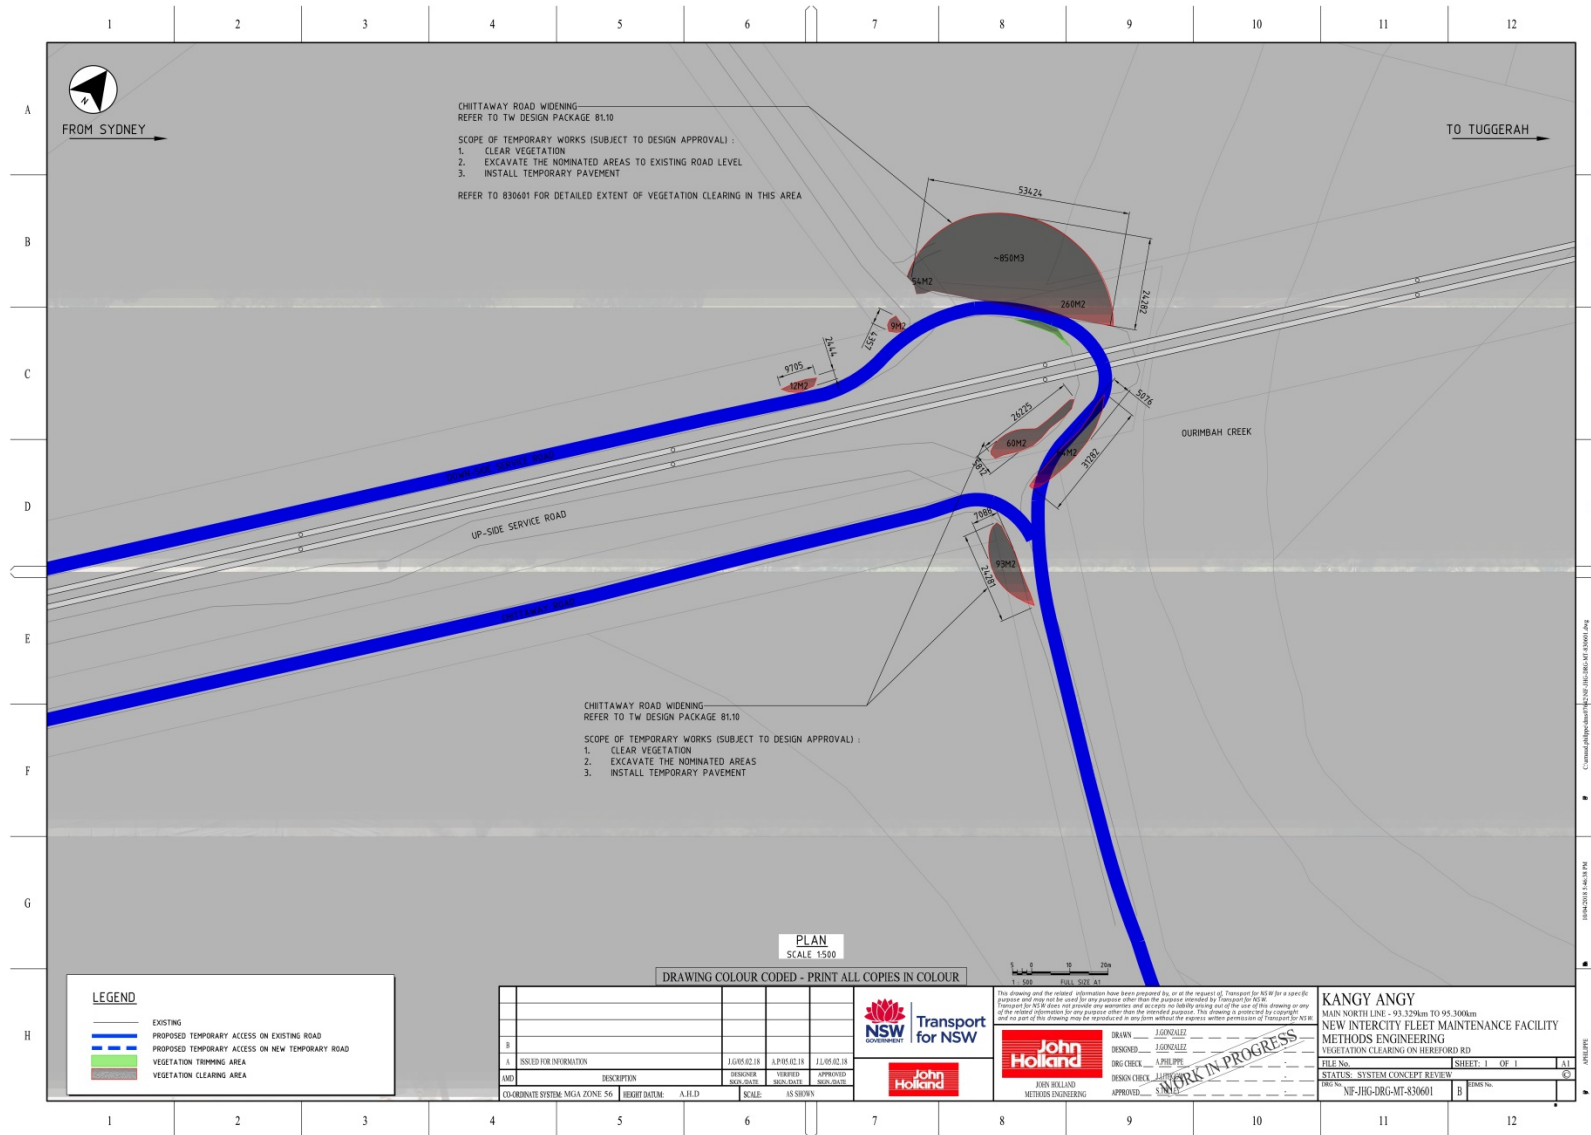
Design plans illustrating proposed earthworks as part of the Chittaway Road turning area
